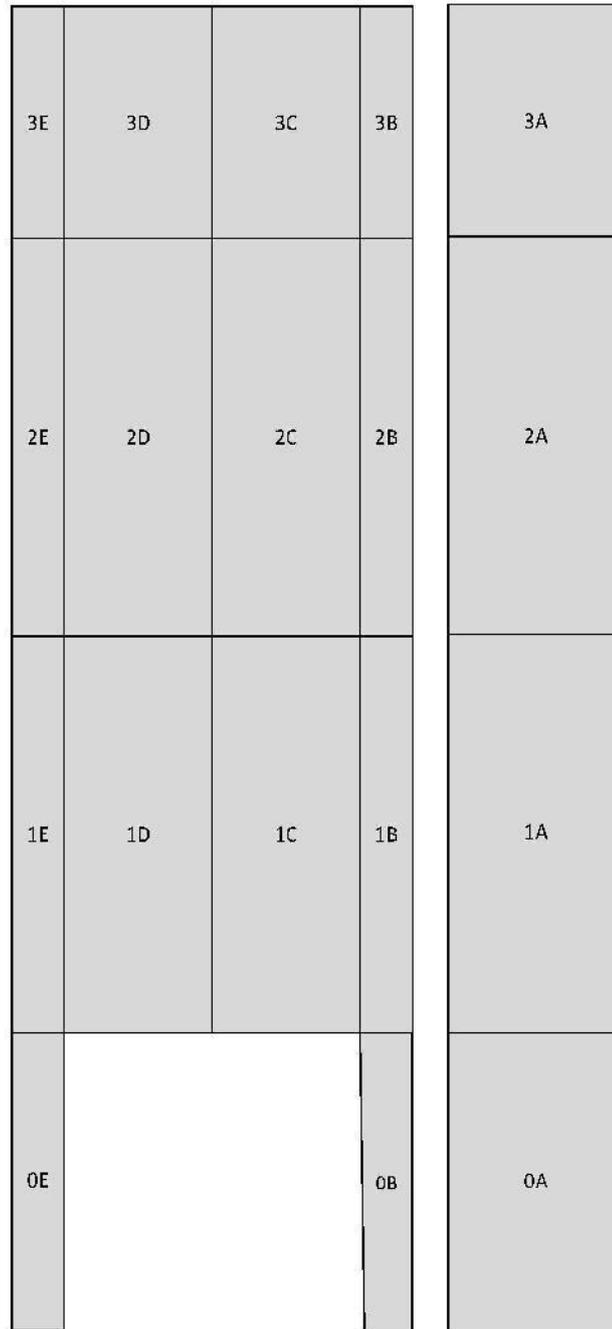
Layout of panels and labelling system used for reporting purposes. Not to scale.
